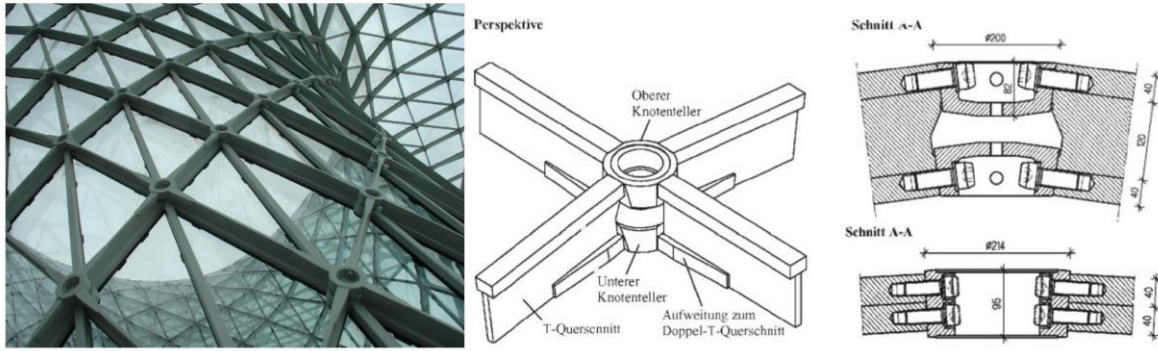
An example of connection detailing in a spatial structure. Canopy roof of Fiera Milano, Architectural design by studio Fuksas. Engineering by Schlaich Bergermann Partners.
